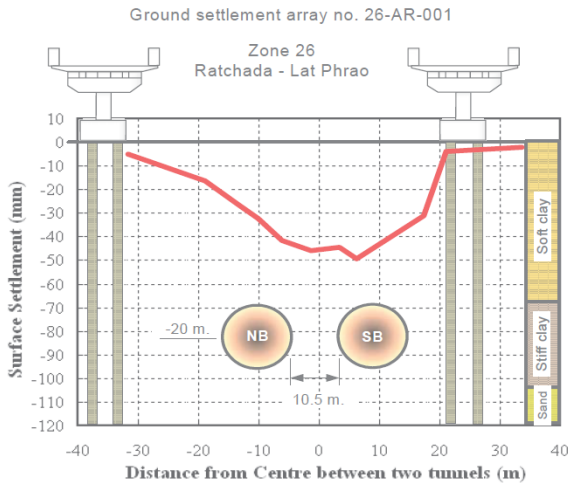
Cross-section of the Bangkok MRT between bridge piles (Phienweij *et al.* 2006)
